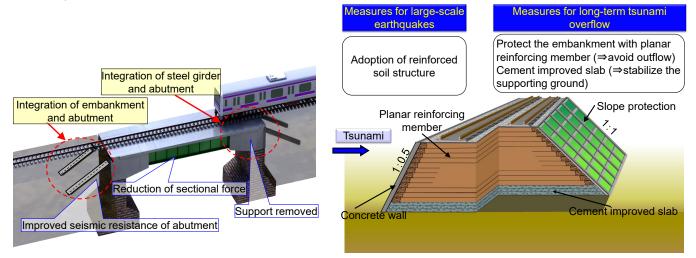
Integrated structural method of steel girder, abutments and backfills (Integral bridge with nail-reinforced soils)
